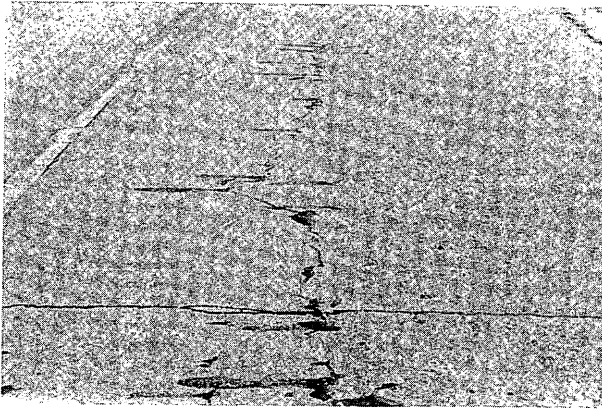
Typical longitudinal transverse cracking in SEA section of Test Road 1 (Kuwait diversion).
